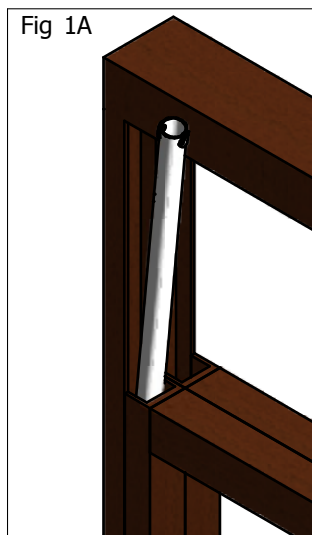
A: Fully lower the sash before inserting the balance into the machined groove in the sash or frame.
